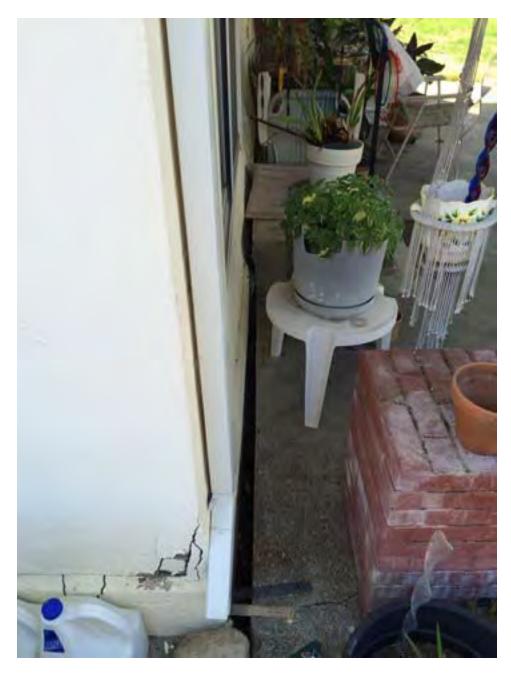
Displacement of patio slab relative to structure foundation; cracking of corner [NSF-GEER; N 38.3041 W 122.3429; 08/25/14 13:18]
